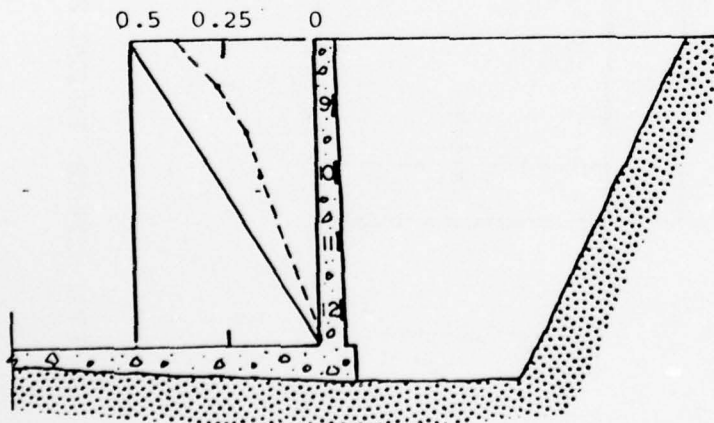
TYPICAL SECTIONS OF RETAINING WALLS, THOMPSON CREEK CHANNEL
